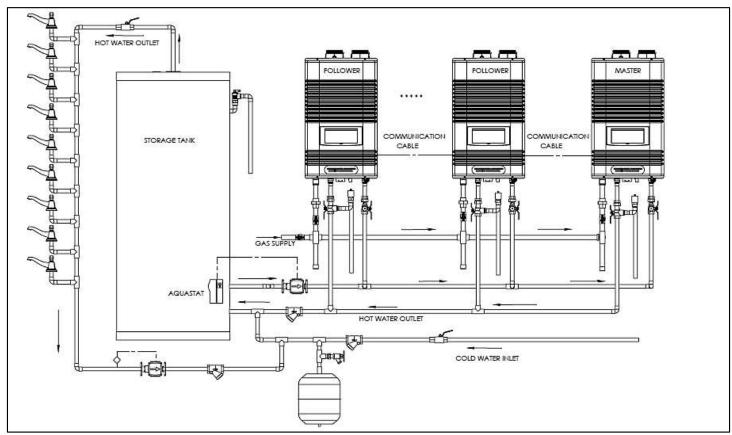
Multiple Water Heater Piping – Cascaded System with Storage Tank and Recirculation
